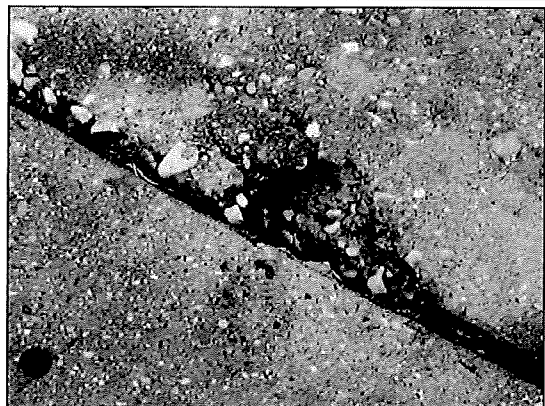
Typical damaged concrete sidewalk is a potential trip hazard.
